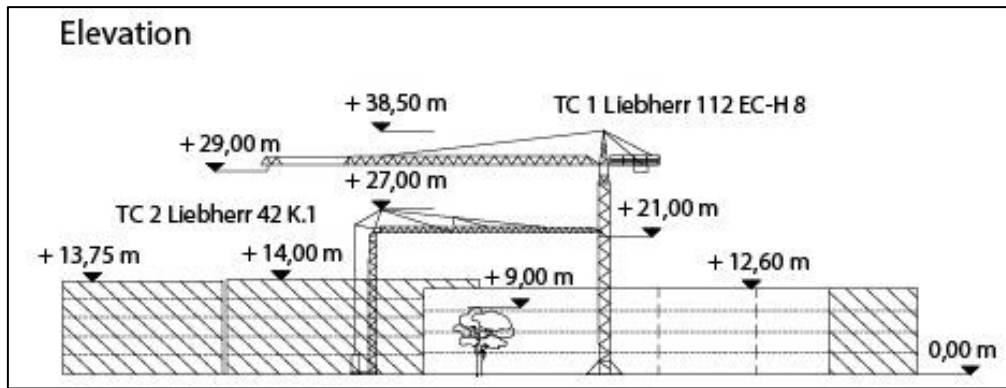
Typical crane elevation drawing (adapted from [13], Bild 3.6)
